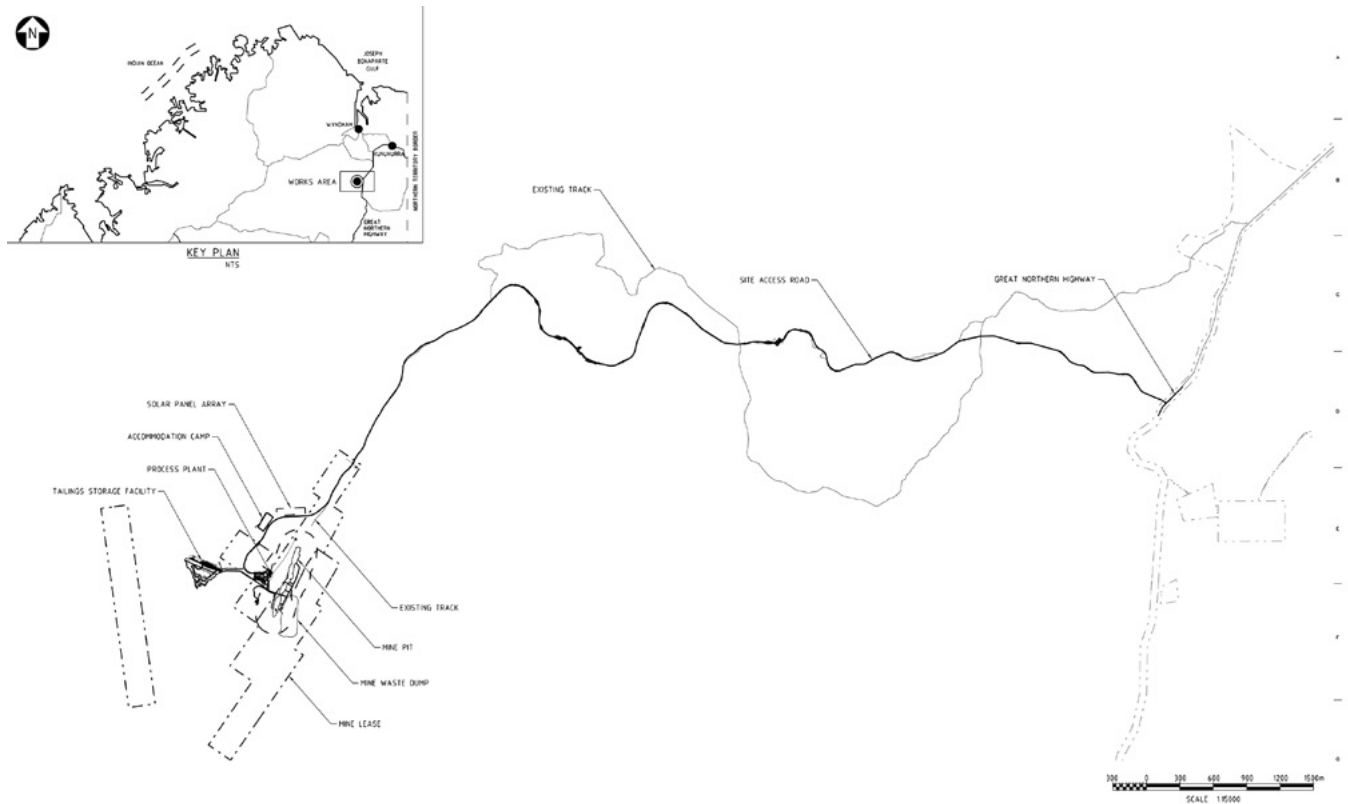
Site plan showing existing exploration tracks and proposed access road alignment produced by Lycopodium
